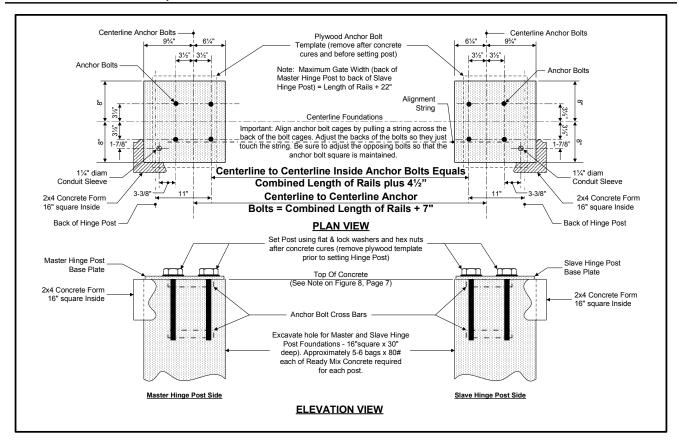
Dual Gate Configuration Foundation Installation Details (Left hand installation shown, See Figure 8, page 7 to adapt for right hand installation)
